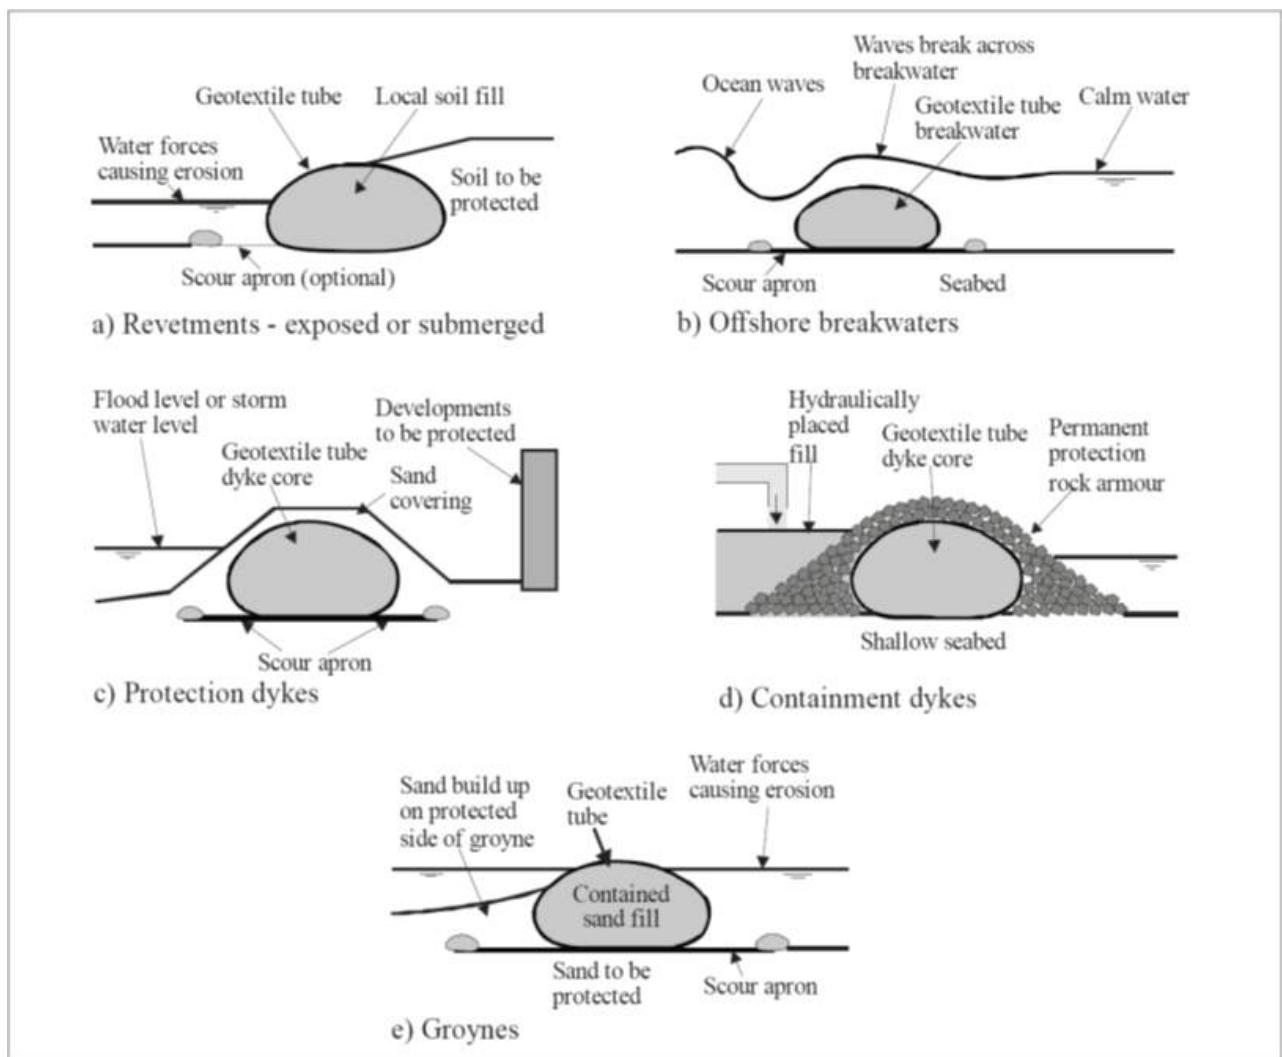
Applications of geotubes for coastal protection (Lawson CR 2008)
